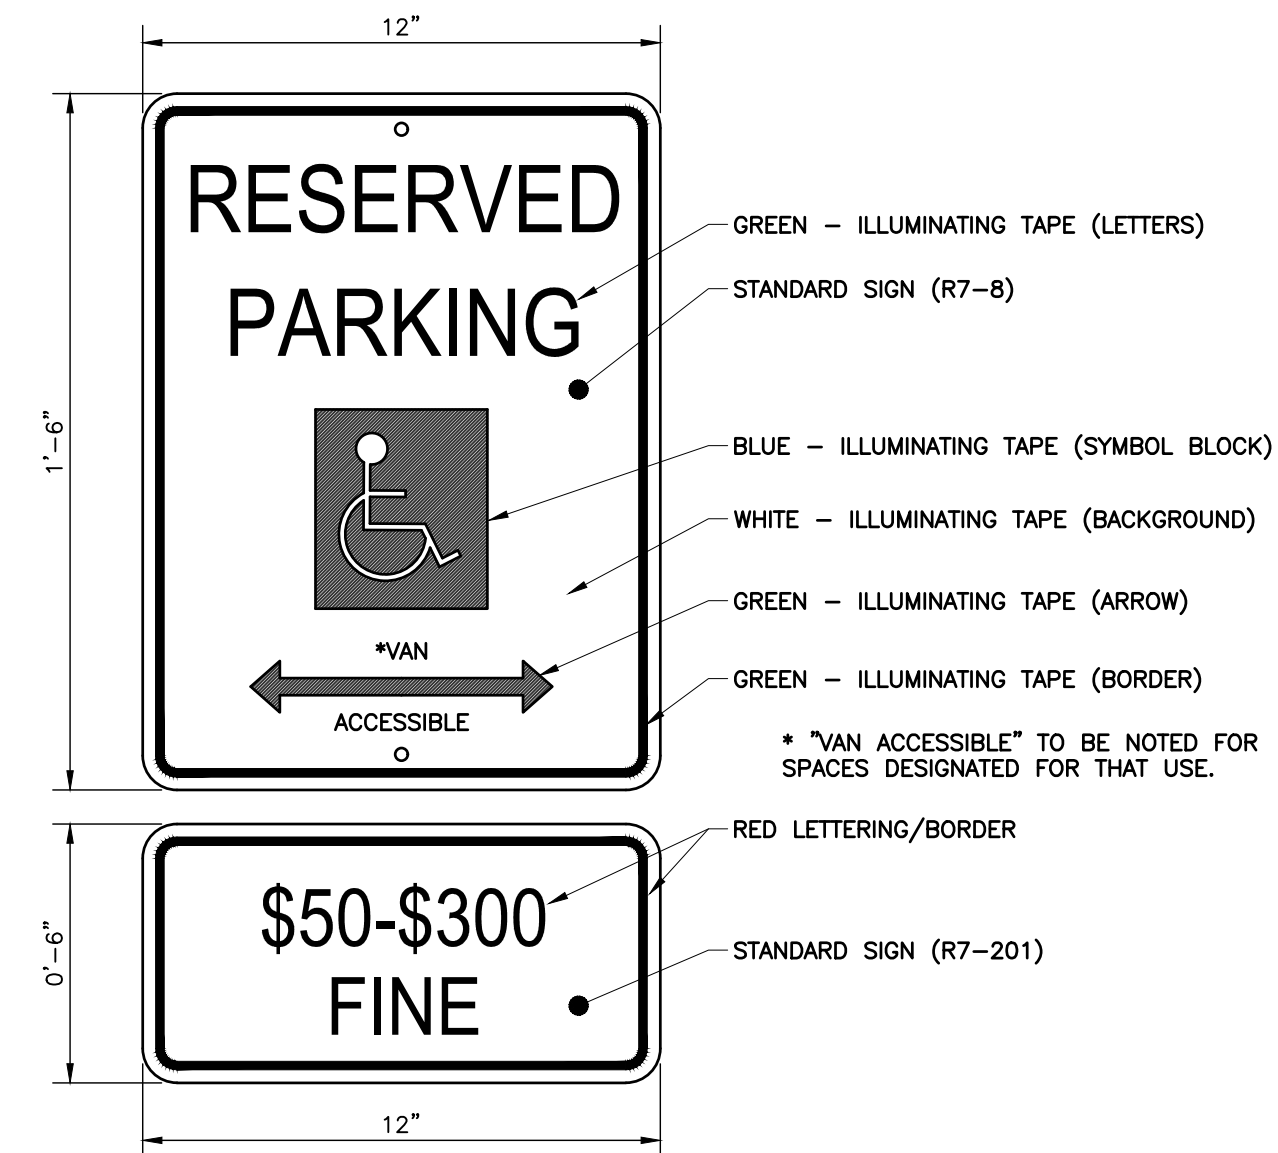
ADA ACCESSIBLE PARKING STALLS
